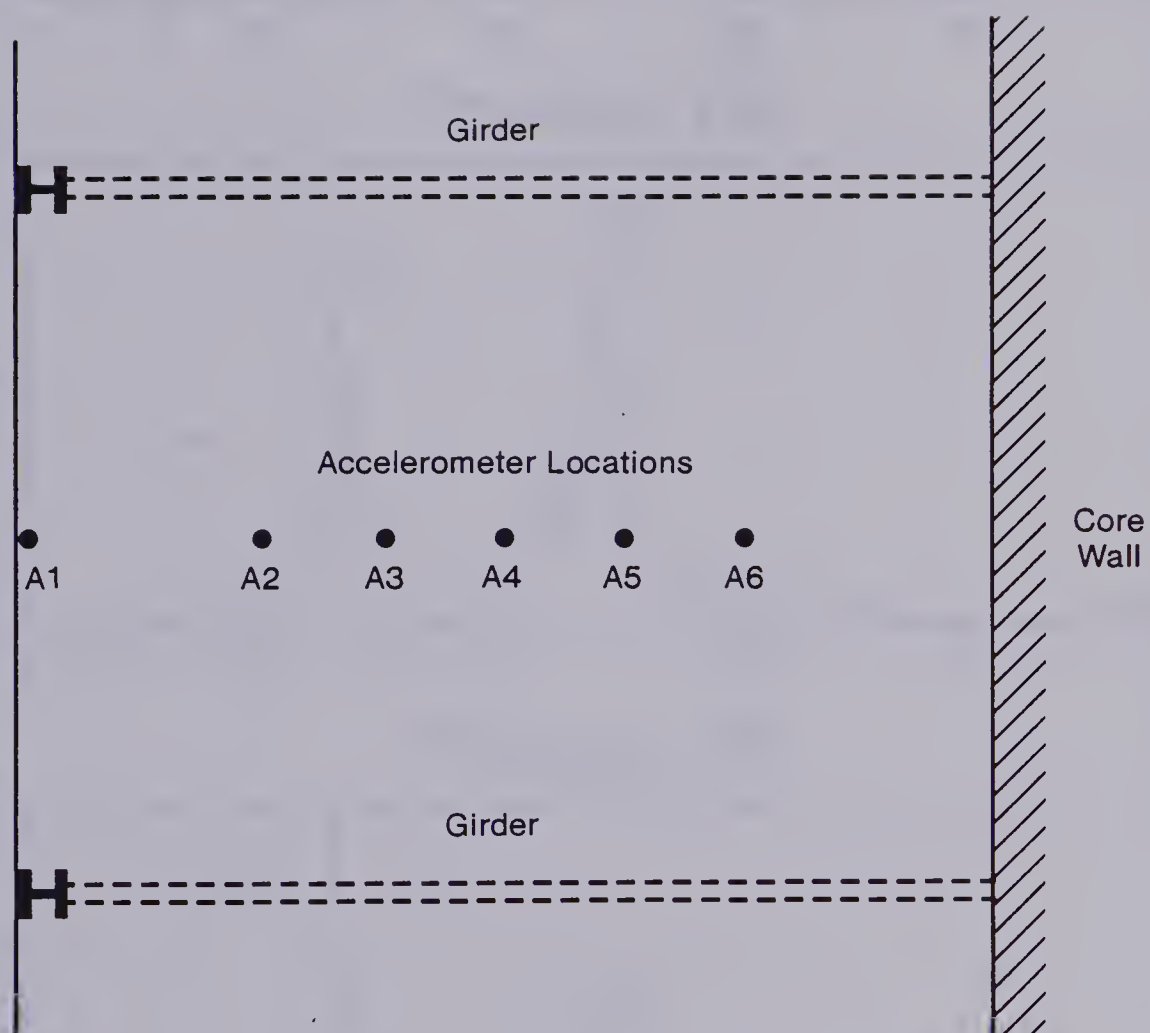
Floor Layout and Accelerometer Locations to Determine Mode Shapes
